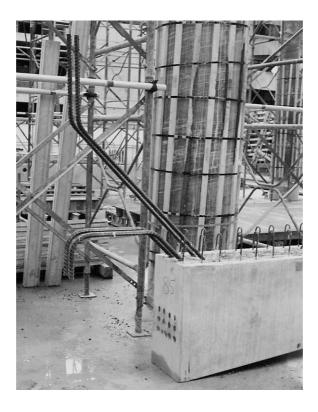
Example of the end reinforcement of a precast prestressed secondary beam with a pinned joint in a construction site in New Zealand (Courtesy of J. Restrepo)
